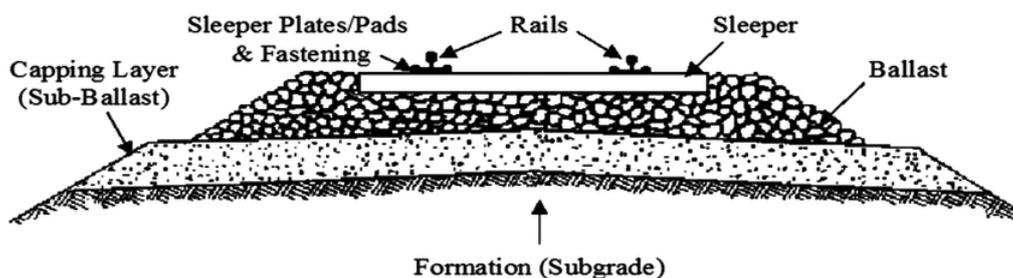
Cross-Section of a typical Railway Track (Elkhoury, 2018)
